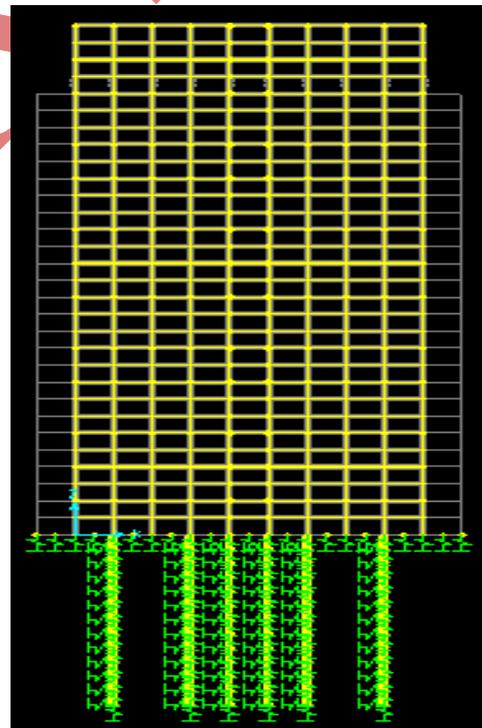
Front view of 25 storey building with pile length  $l = 30$  m
